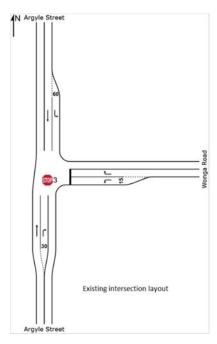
Wonga Road and Argyle Street Intersection – Existing Layout
